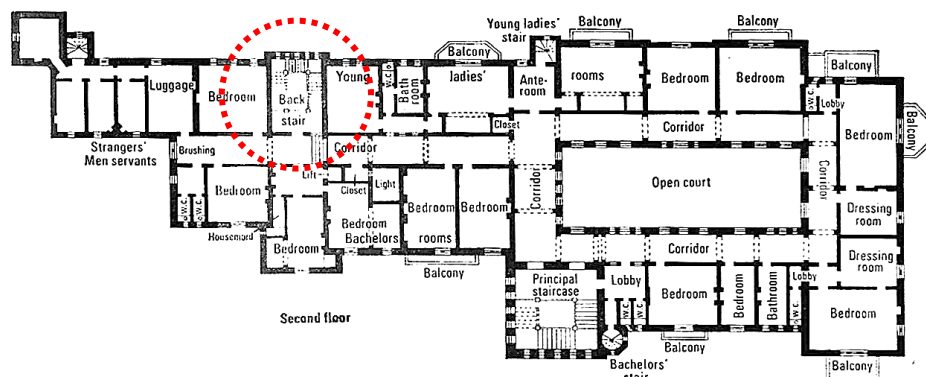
Second Floor – Historic plan. 'Back Staircase' marked in red.
